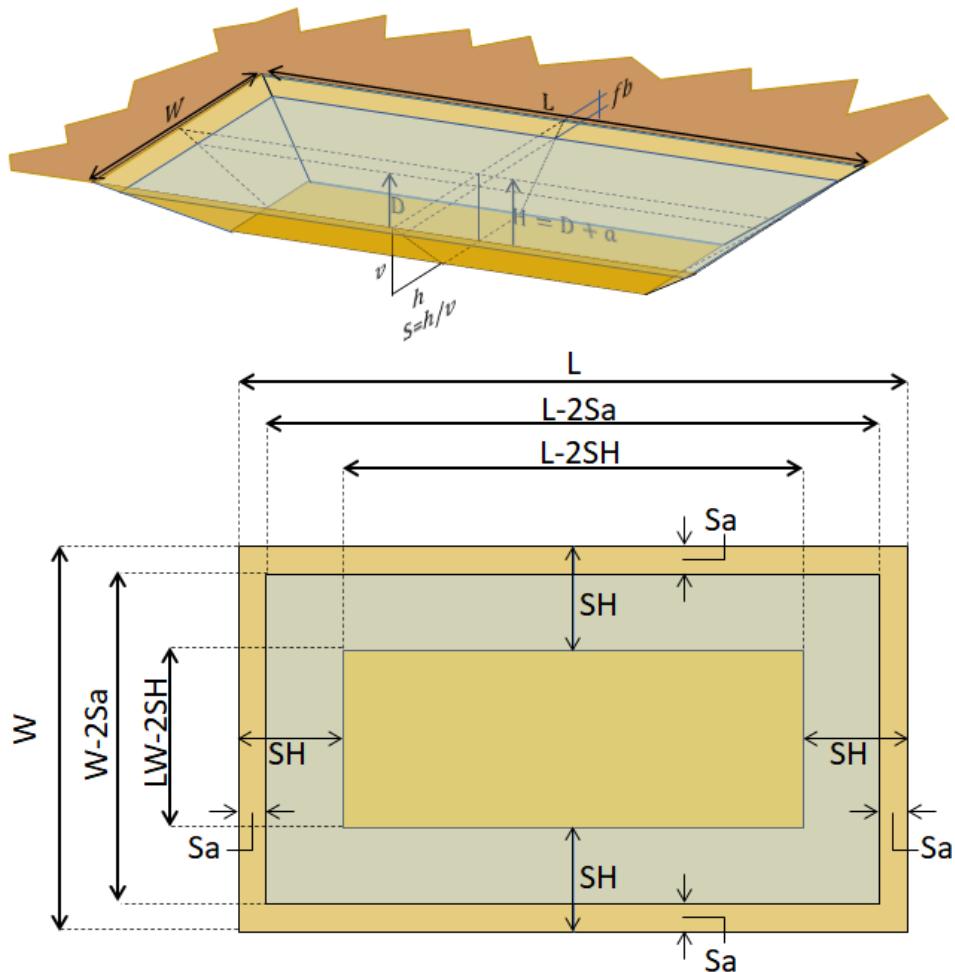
Definition Sketch for a Rectangular Reservoir.
